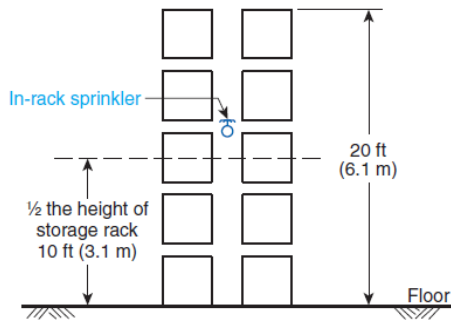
Positioning of One Level of In-Rack Sprinklers for Storage Heights Under 25 ft (7.6 m).
